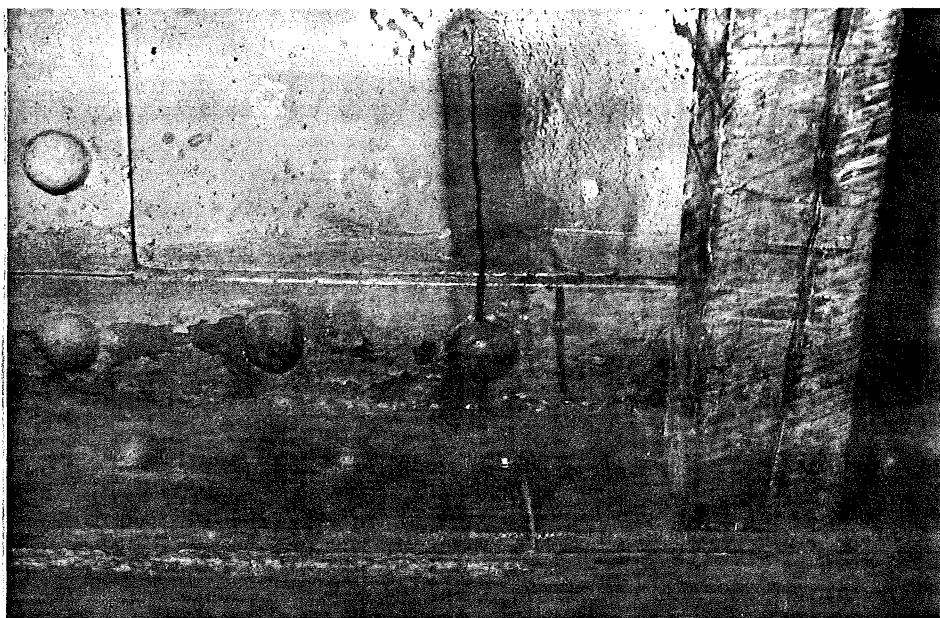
Fractured Flange Angles of Girder No. 9
